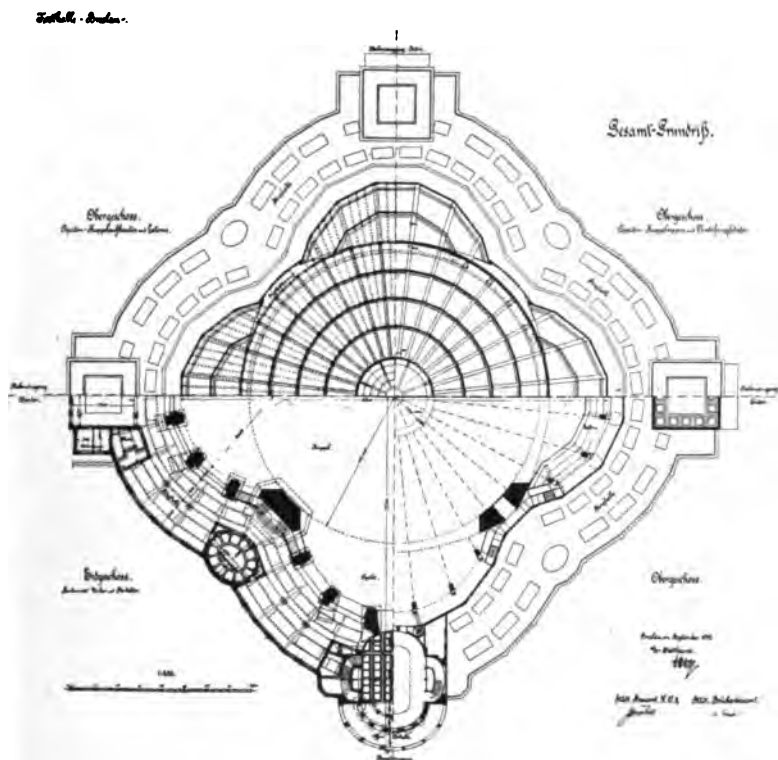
PLAN OF CONVENTION HALL, Breslau, Germany.
